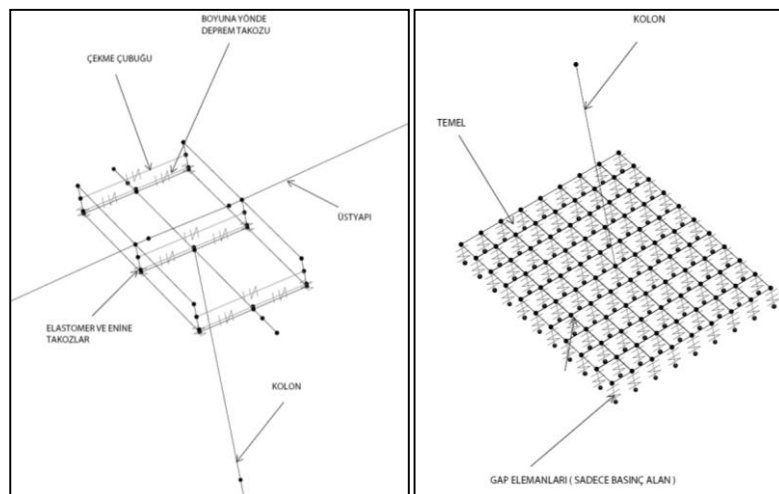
Seismic Model of Nurtepe Viaduct Pier Cap and Foundation Details[6]
